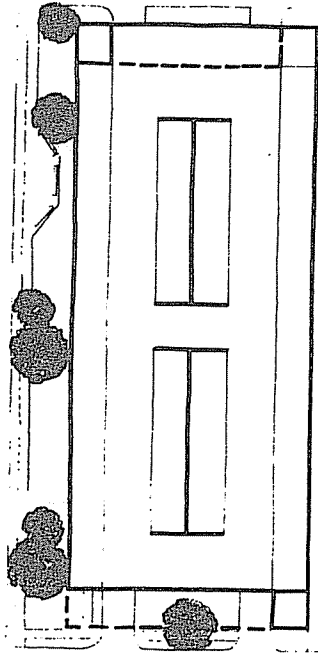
Conceptual plan of north-south, half-block parking structure featuring expanded pedestrian area
